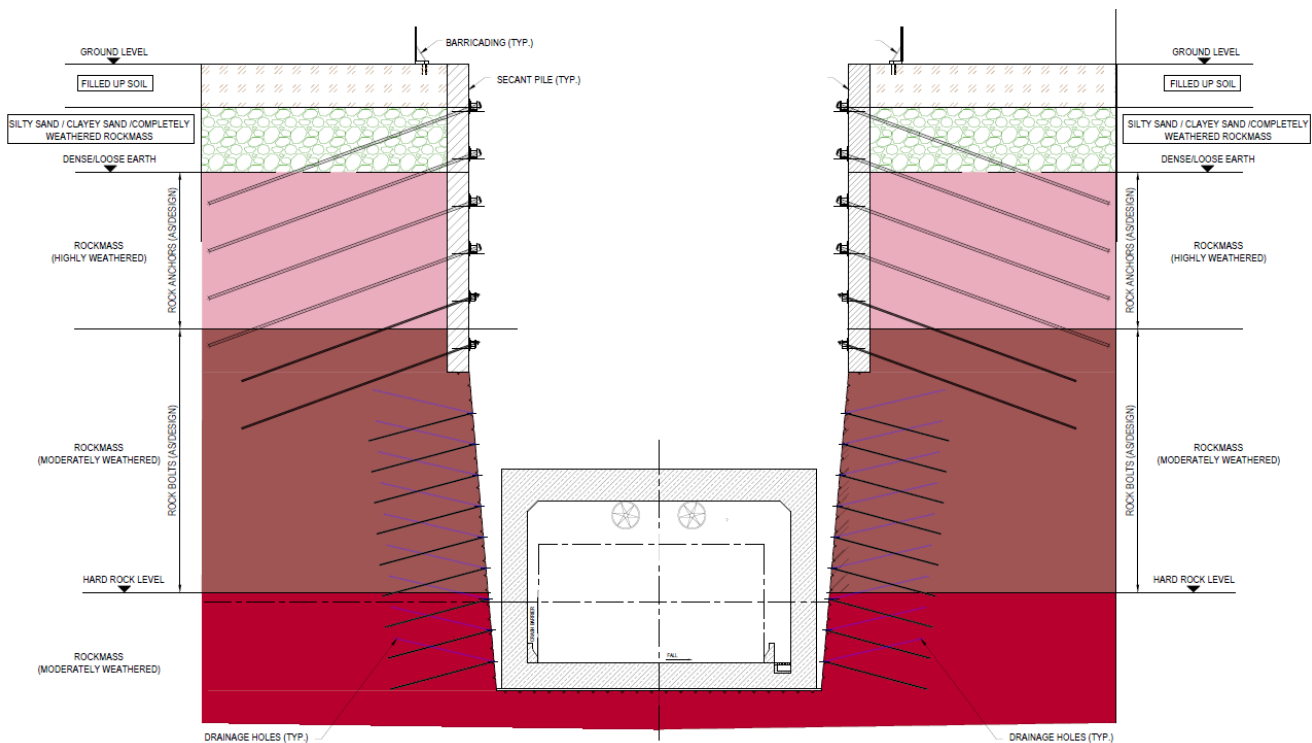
Typical Section Detail of Deep Excavation for Shaft & Cut and Cover Zone
